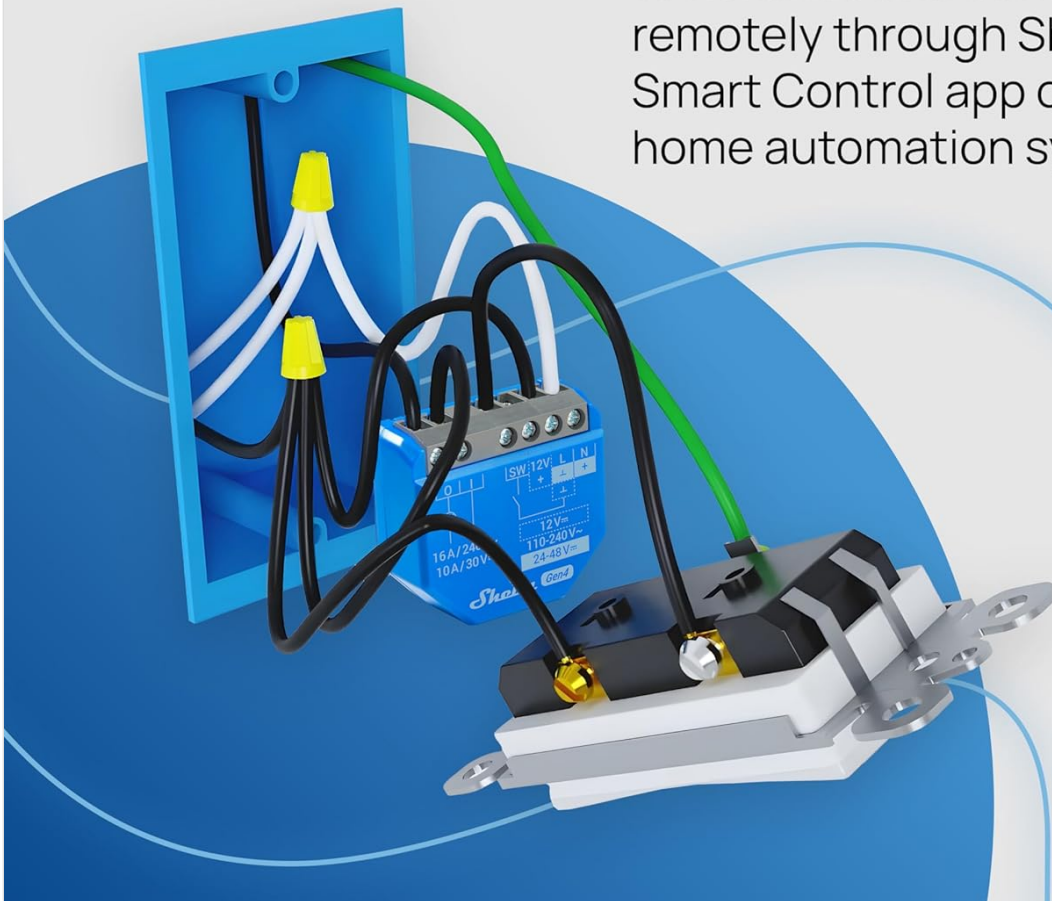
Example wiring diagram for installing Shelly 1 Gen4 behind a standard wall switch.
